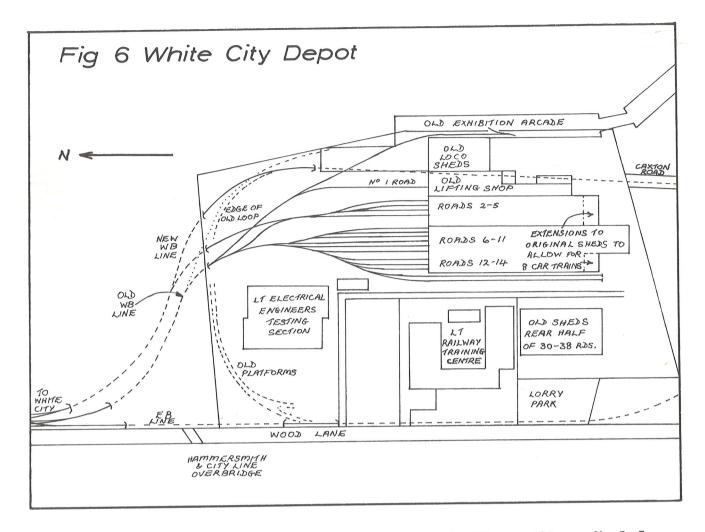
New layout as opened in August 1949, and still in use today. Road Nos 11 - 14 became Nos 2 - 5 roads Nos 15 - 23 became Nos 6 - 14. The sheds housing Nos 2 - 5 roads and Nos 12 - 14 roads were extended to accommodate 8 car trains. Two outside roads, Nos 15 and 16, were laid on the site of the former 25 and 26 roads. The Railway Training Centre was laid on the Wood Lane side of the depot in 1963, and the Wood Lane Sheds and part of the car cleaning shed had to be demolished to accommodate it. The remainder of the car cleaning shed is still standing, and is used for storing bus shelters. The open space left near the depot entrance in Caxton Road is used for turning buses terminating at Shepherds Bush Green. The connection to the West London line was disconnected when the goods yard was closed. Two new rail connections to the depot were provided, one from the new WB line and one from the original WB line. The one from the original WB line ran along the old platform 4 for ¾ of its length and then curved south towards the depot. The connection from the new WB line ran almost parallel to the other one.
